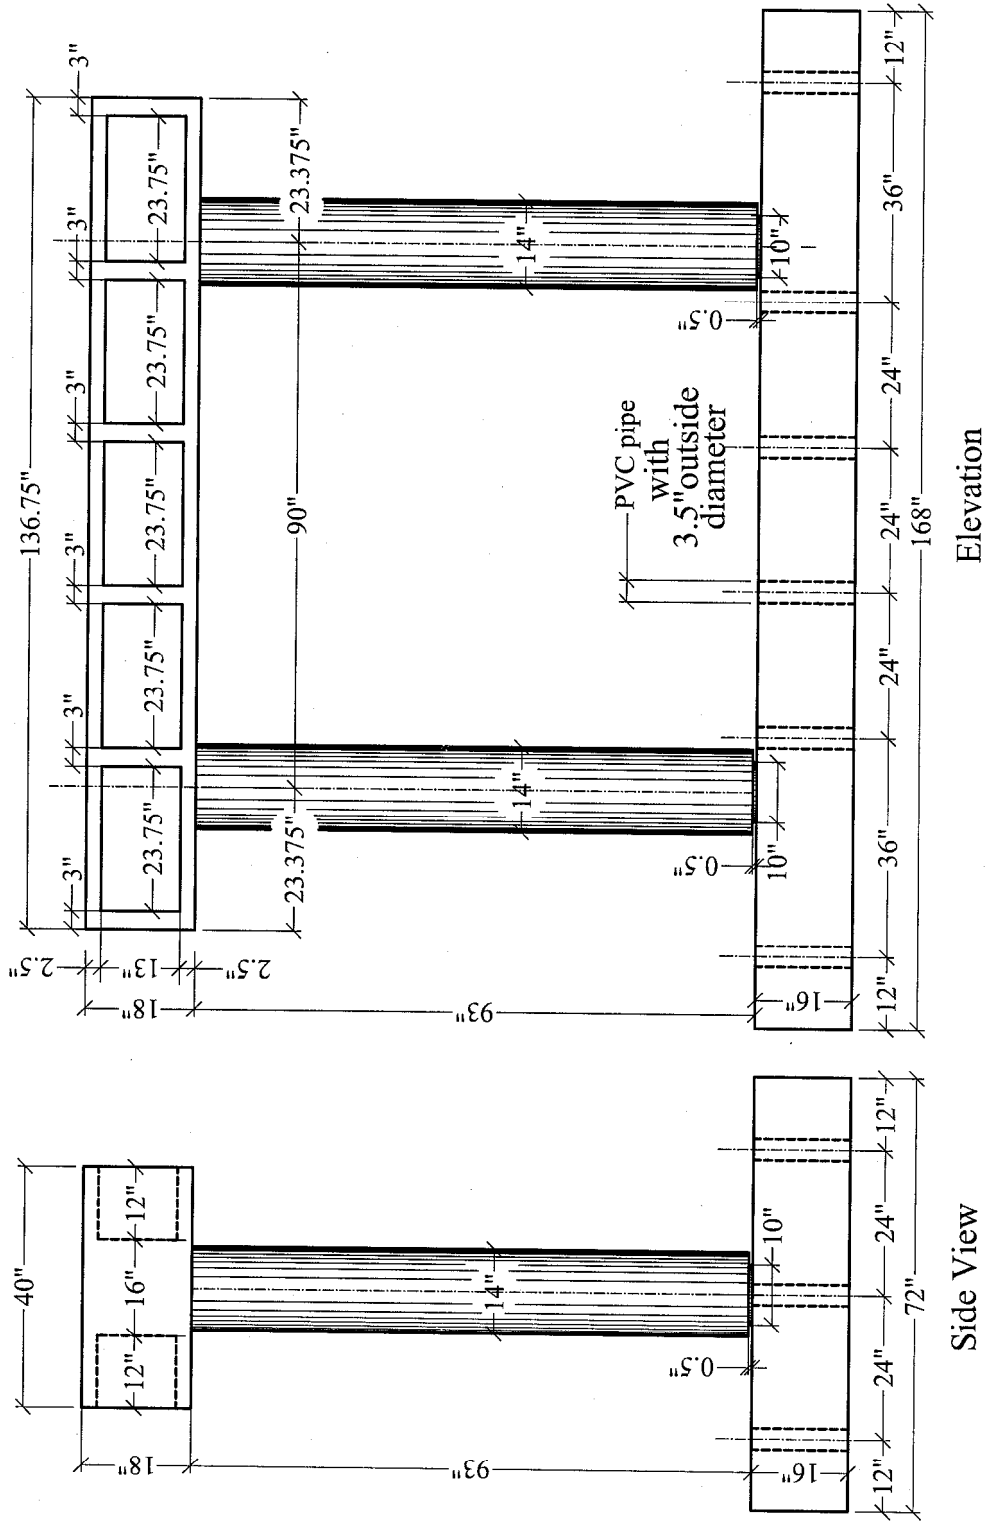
Concrete Dimensions of Specimen B2CT, (English Units)
